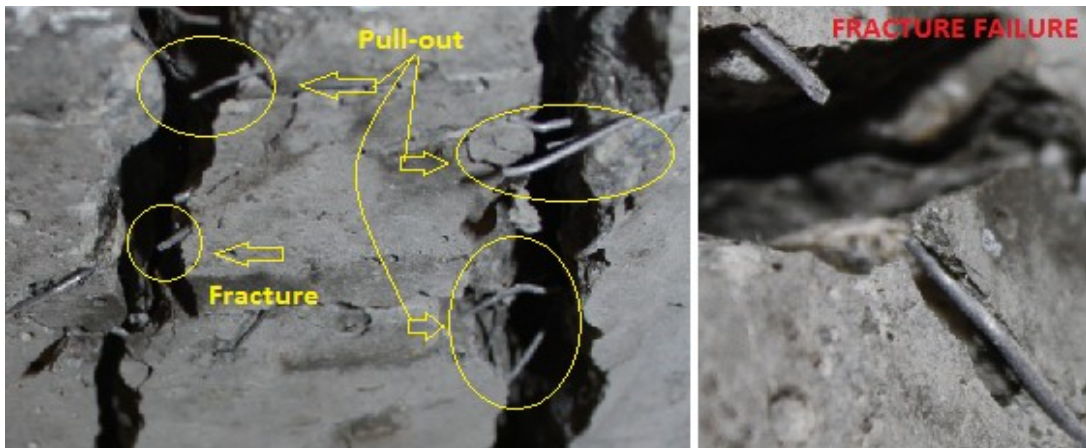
Bottom of VCC\_MF beam, pull-out and fracture of steel-fiber
